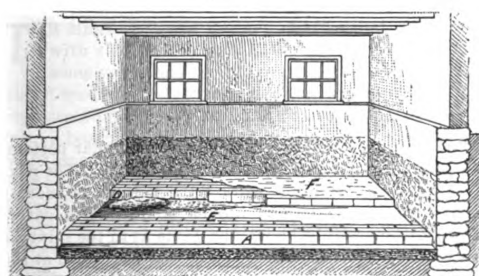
Showing Method of Piling the Brick Ready for Use; also a Section of the Work in an Advanced Stage.
